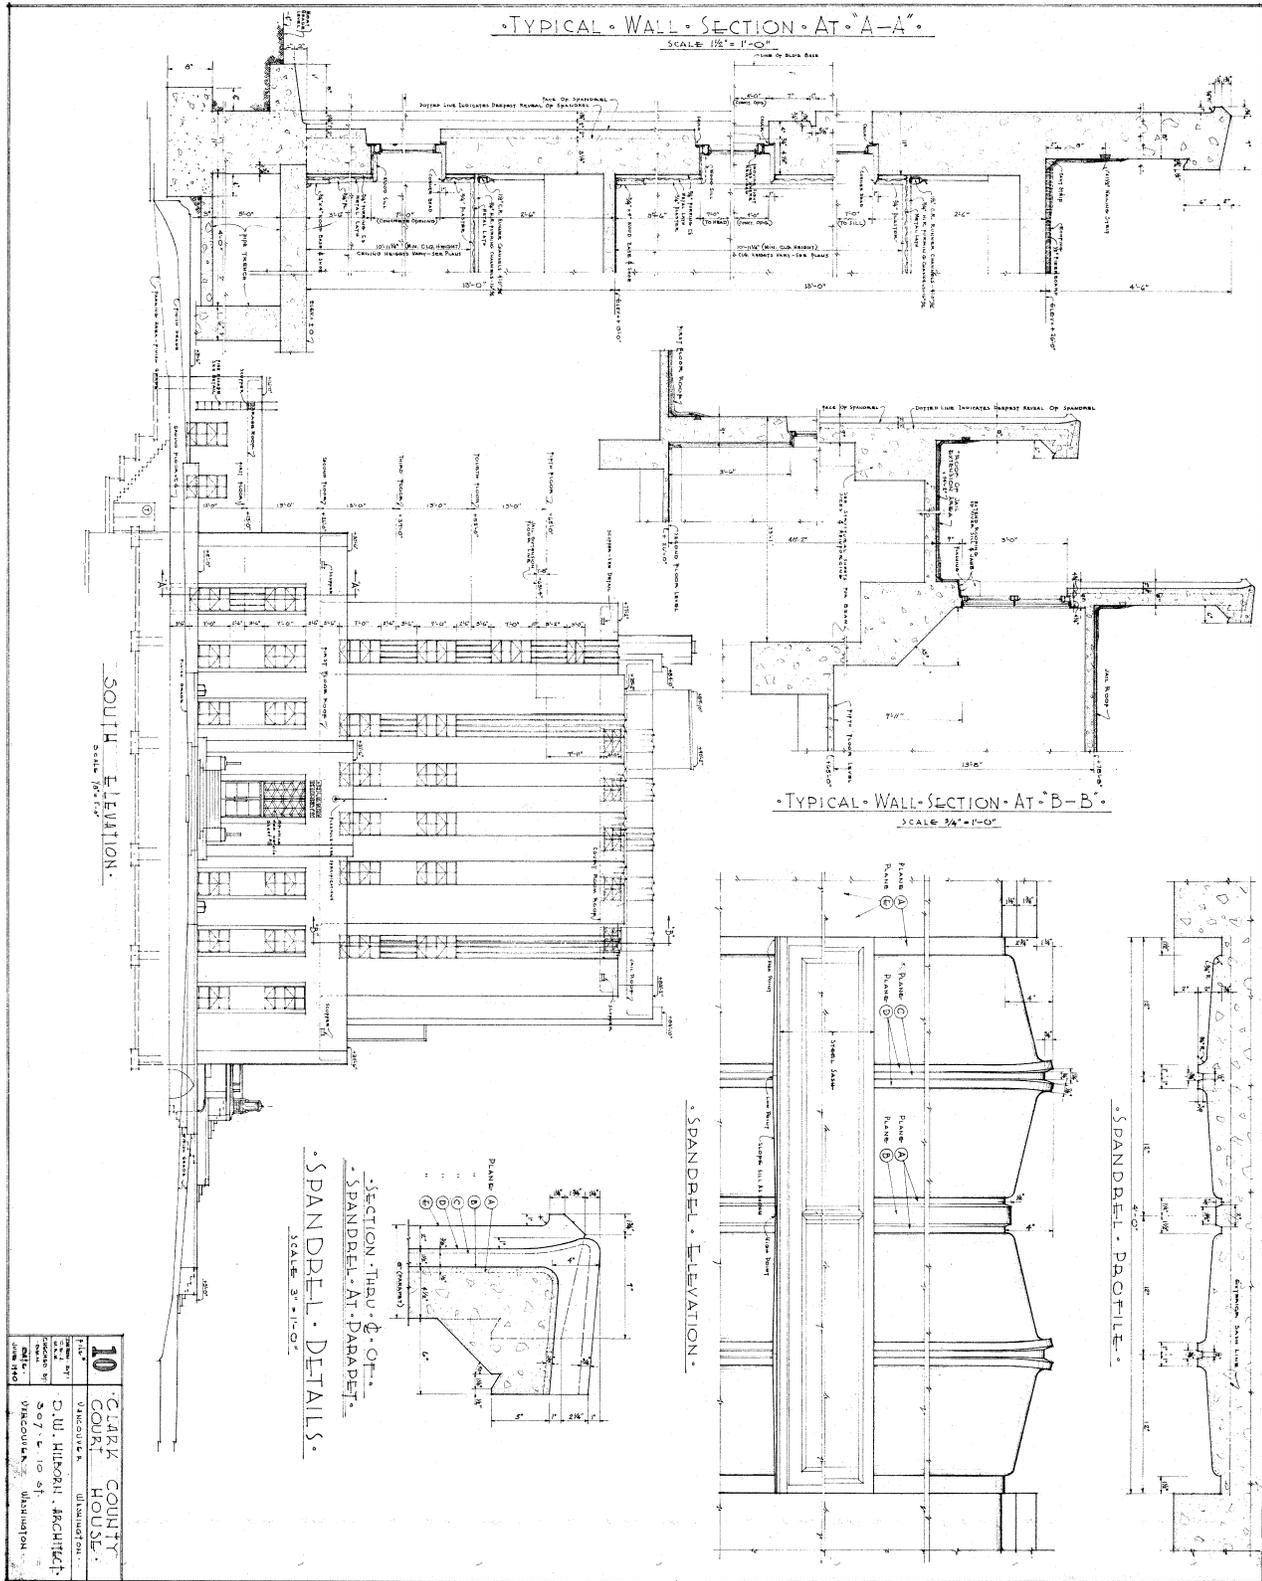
Courthouse Elevation Drawing – South Elevation with spandrel details
